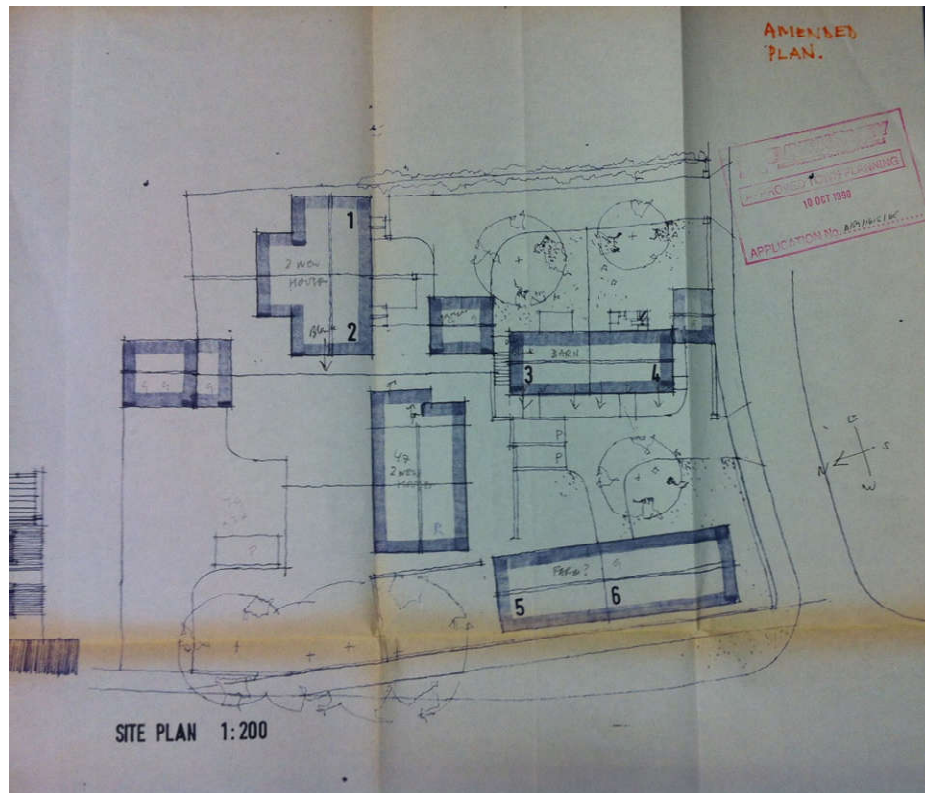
Layout Plan for Extant Planning Consent (not to scale shown)
